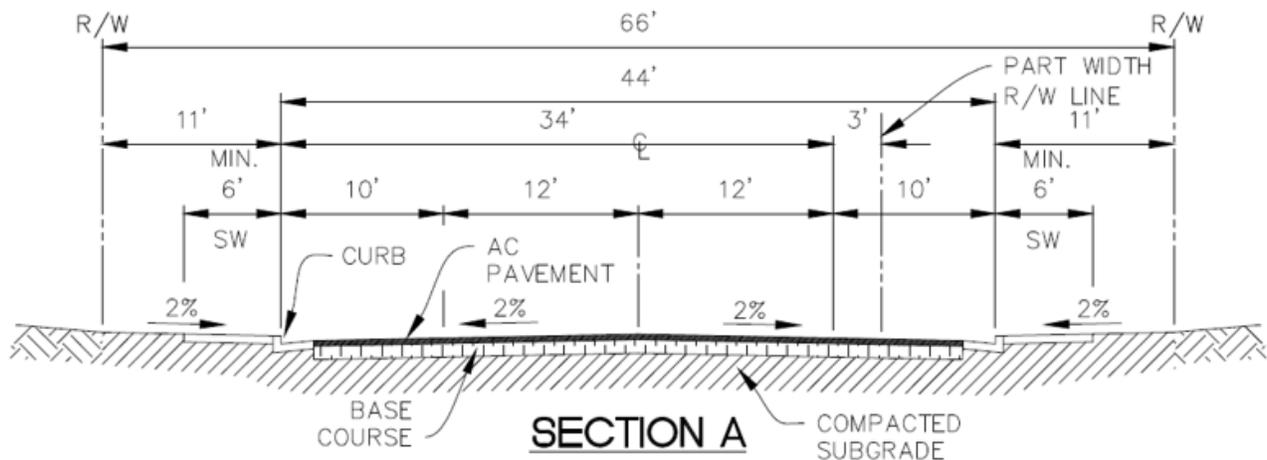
JEFFERSON AVENUE STRIPING
